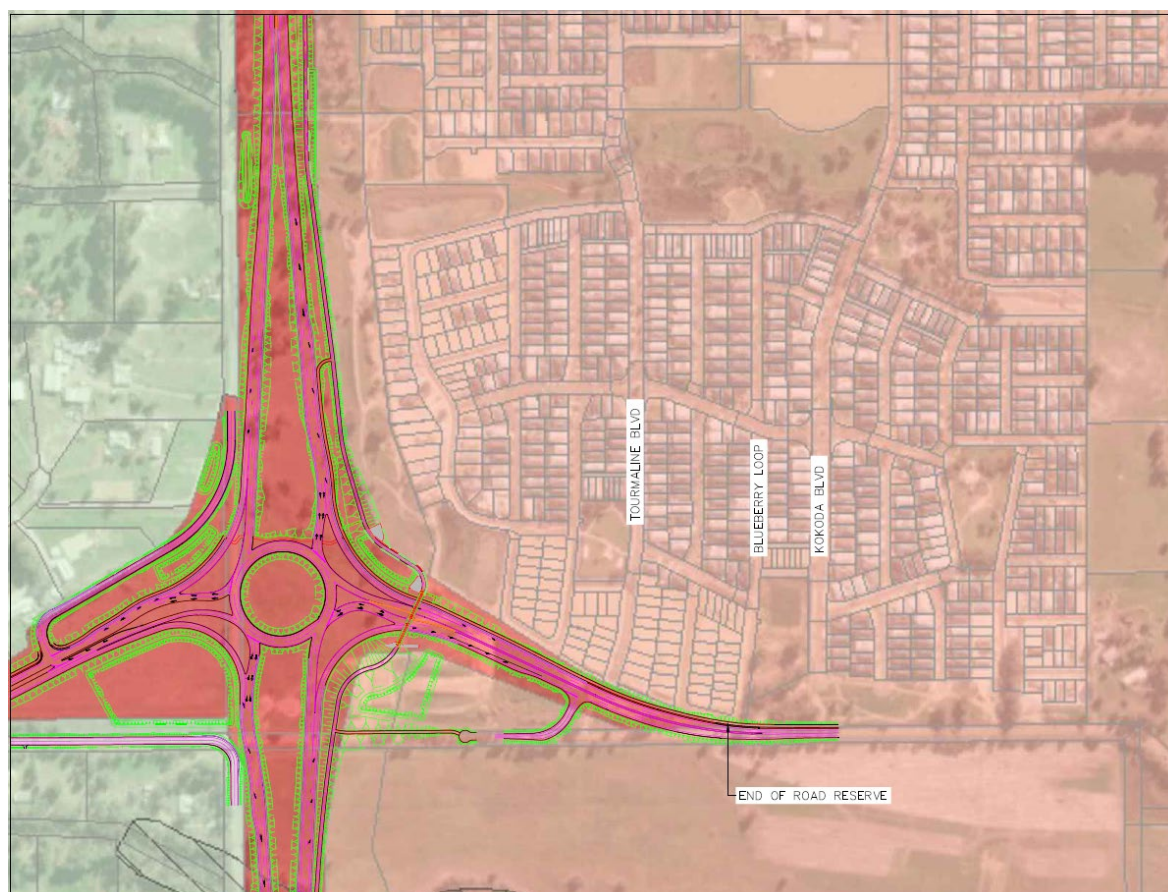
Main Roads WA draft concept design for Tonkin Highway/ Orton Road intersection
